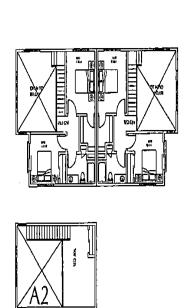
EXHIBIT D - FLOOR PLANS 1/8" = 1' - 0"
